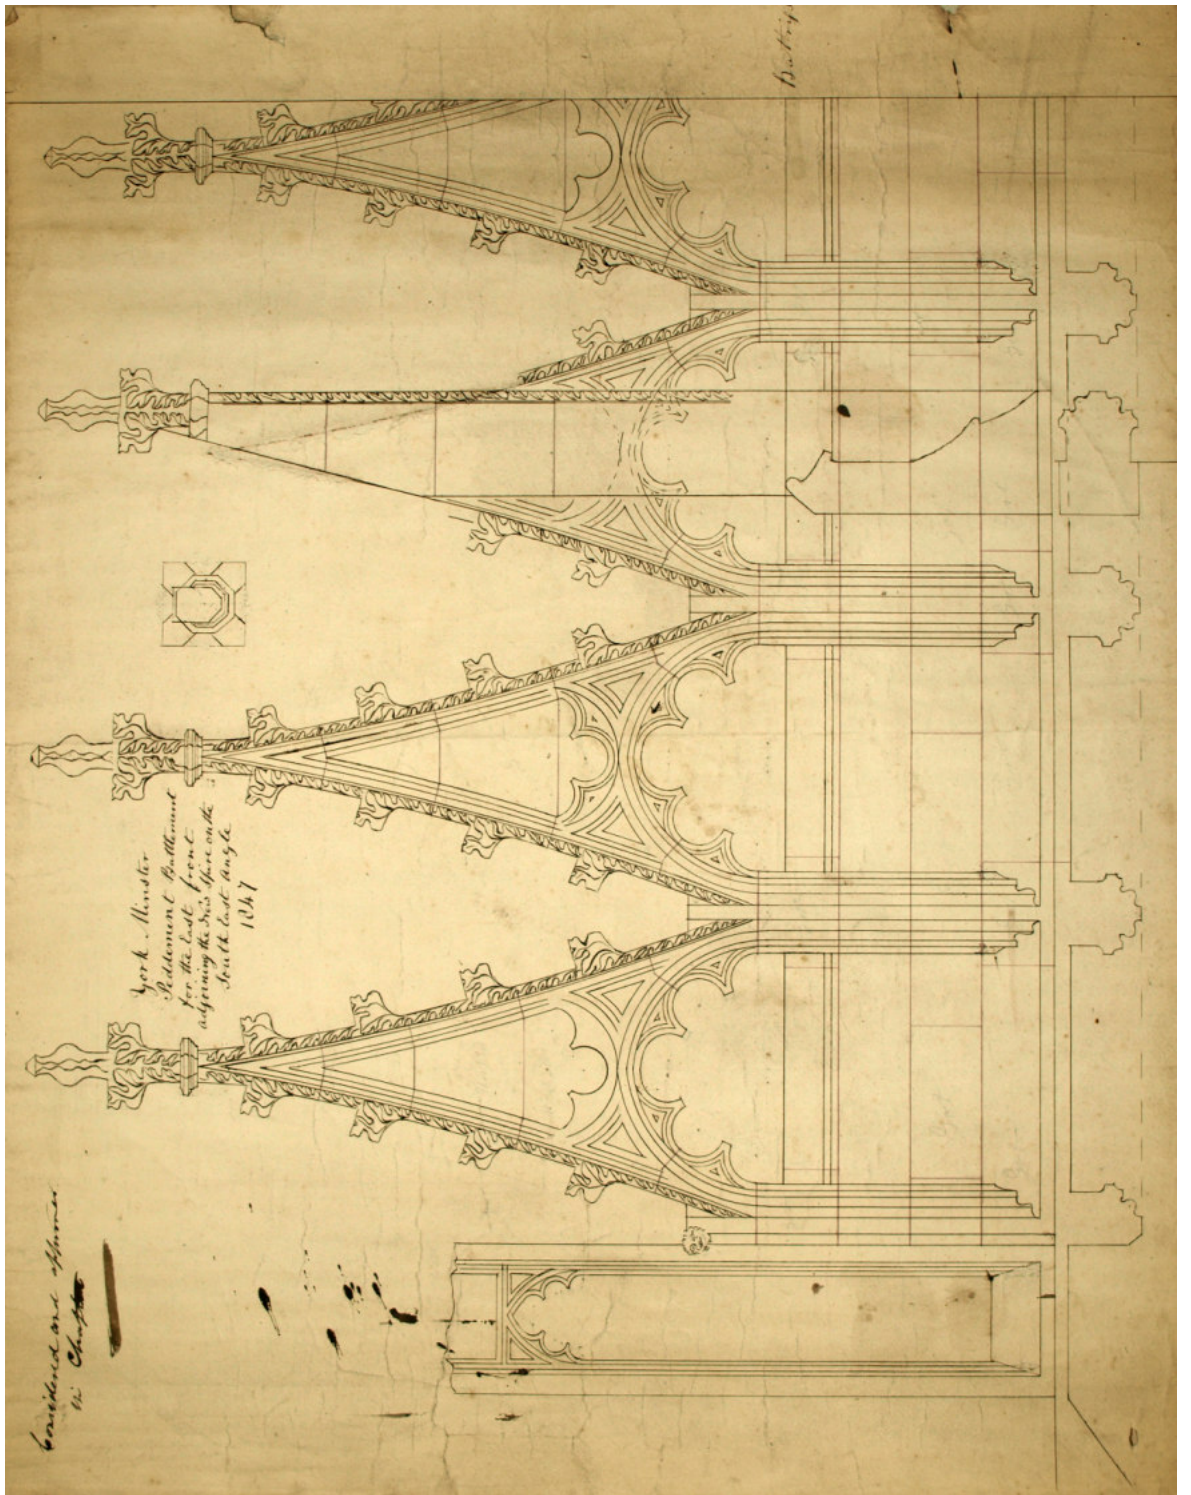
Elevation and section of south parapet gables, 1847 (YML/3/22)
